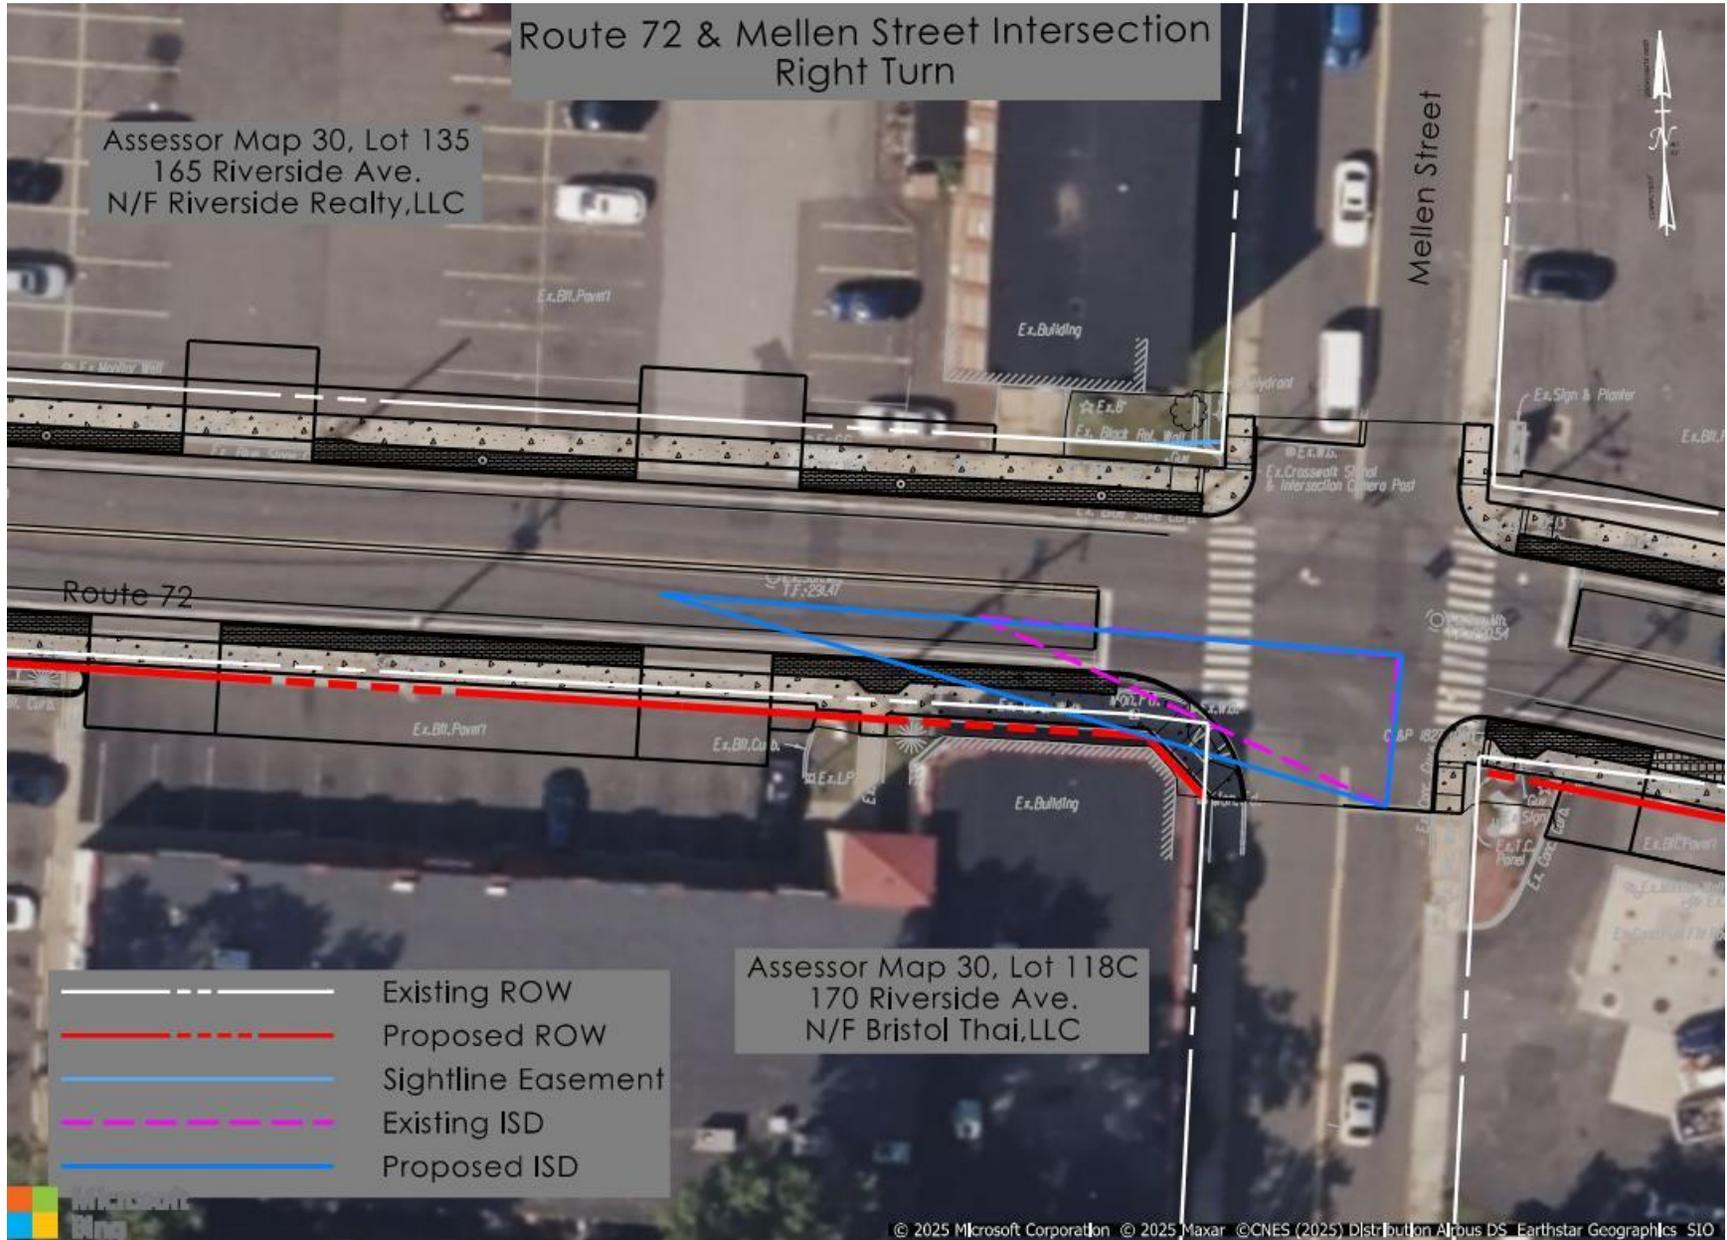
Route 72 & Mellen Street Intersection – Right Turn
